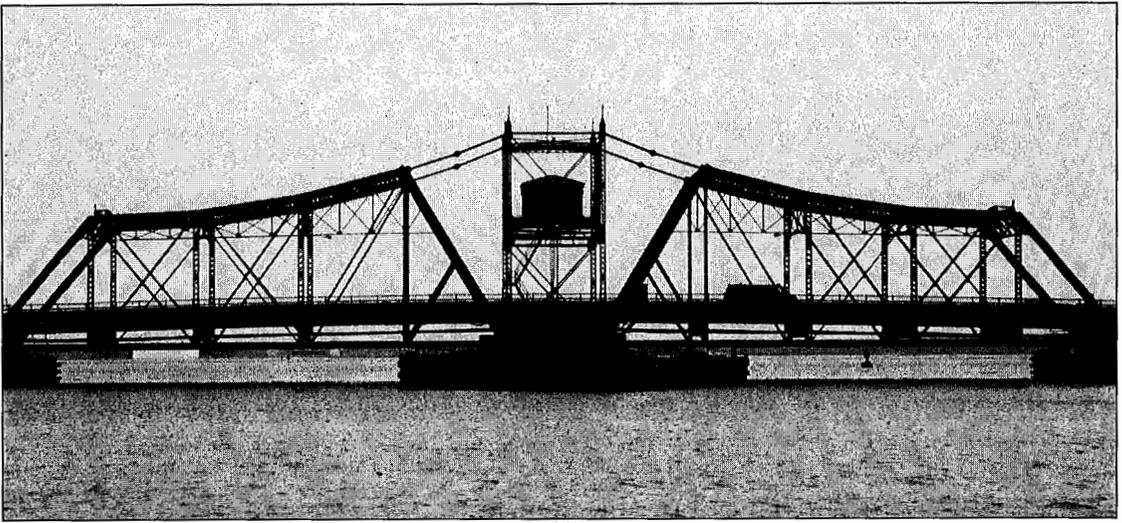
The New Bedford-Fairhaven Bridge in the closed position (1998).
